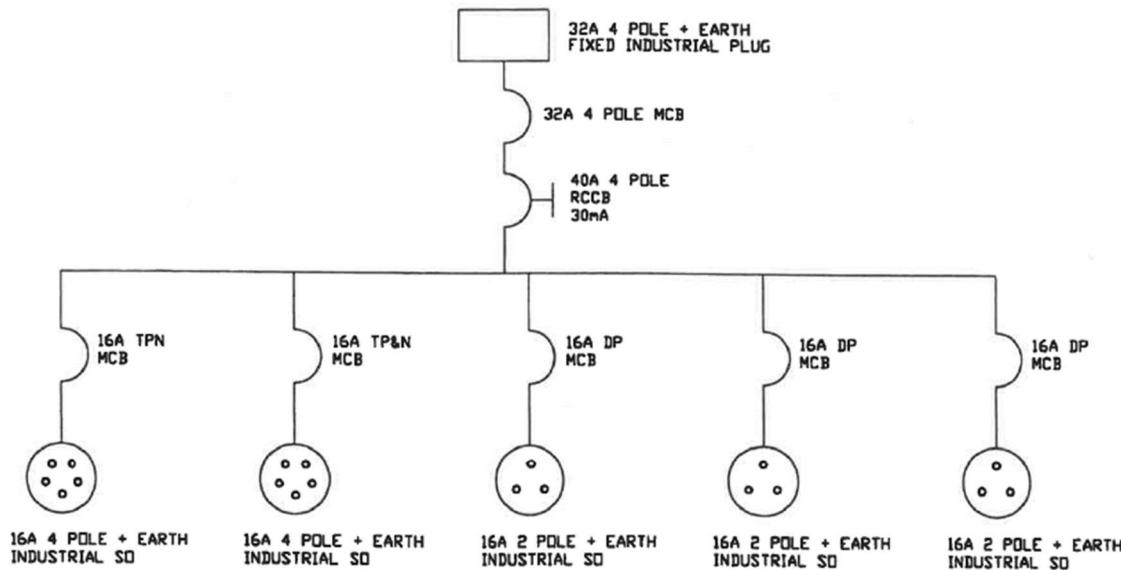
Example of three-phase and single-phase socket-outlet assembly
